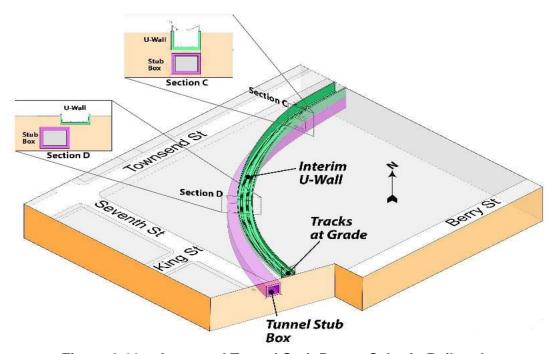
Approved Tunnel Stub Box at Caltrain Railyard
